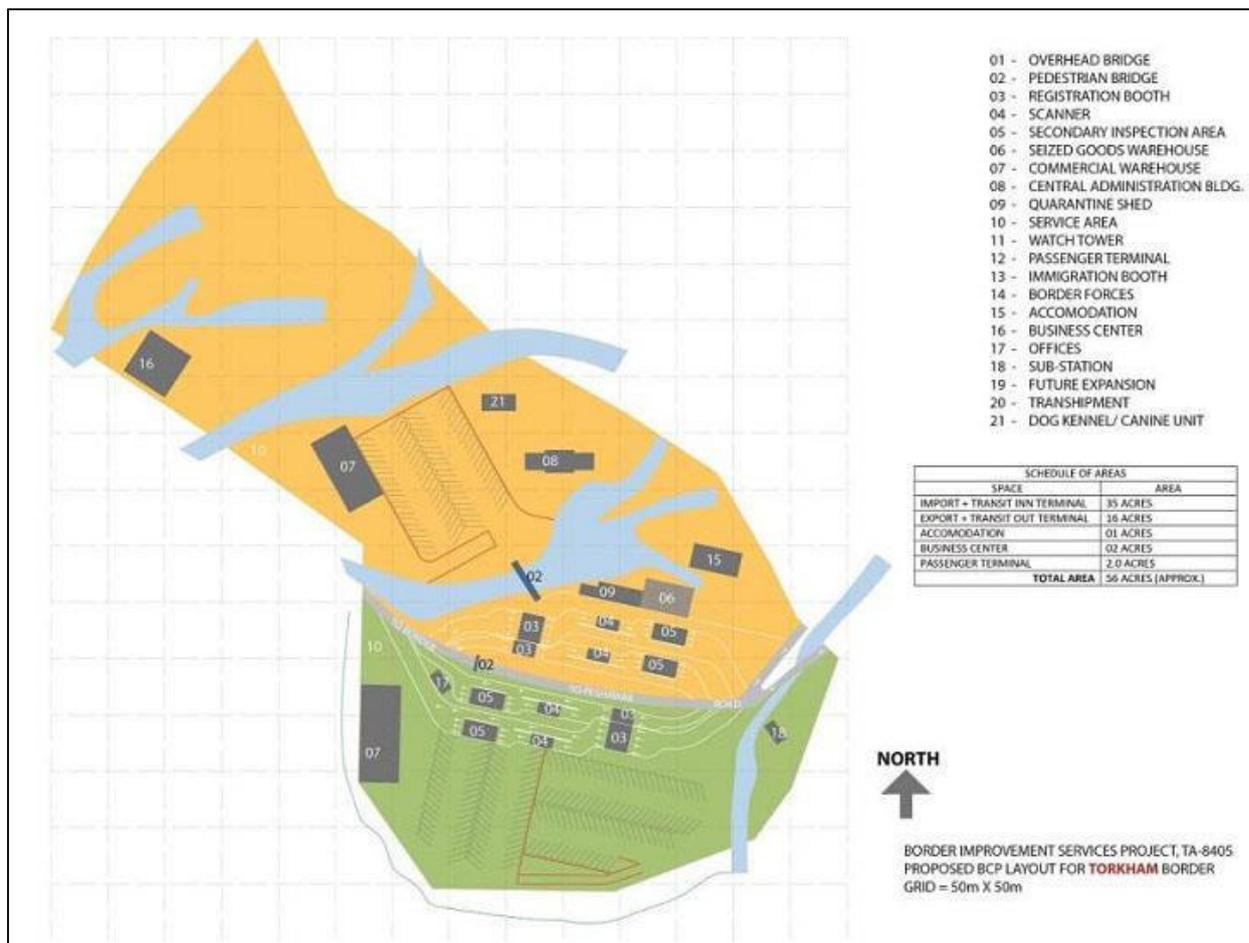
Torkham Border Crossing Design and Layout Proposal
